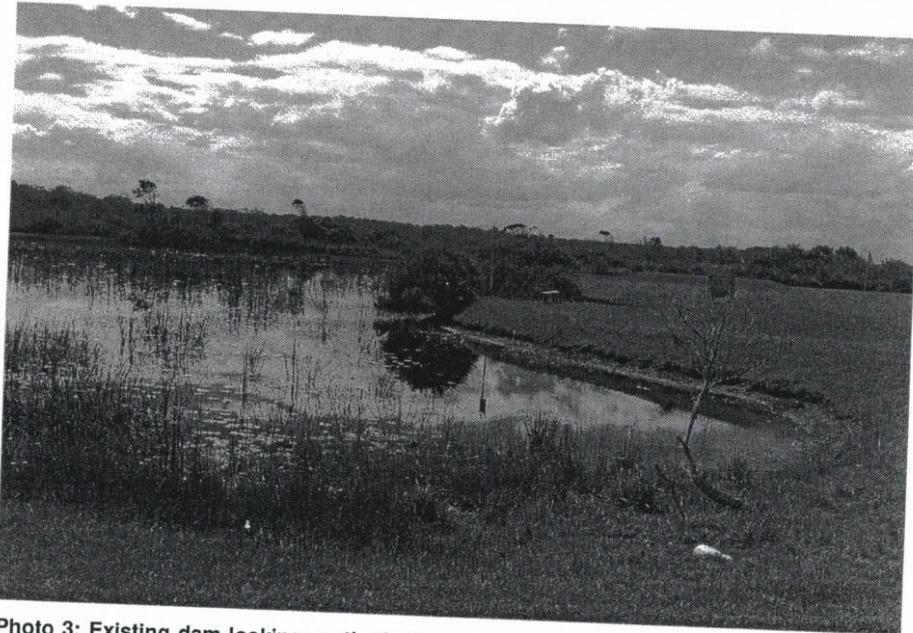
Existing dam looking north along eastern edge of dam (area to be reclaimed for road).
